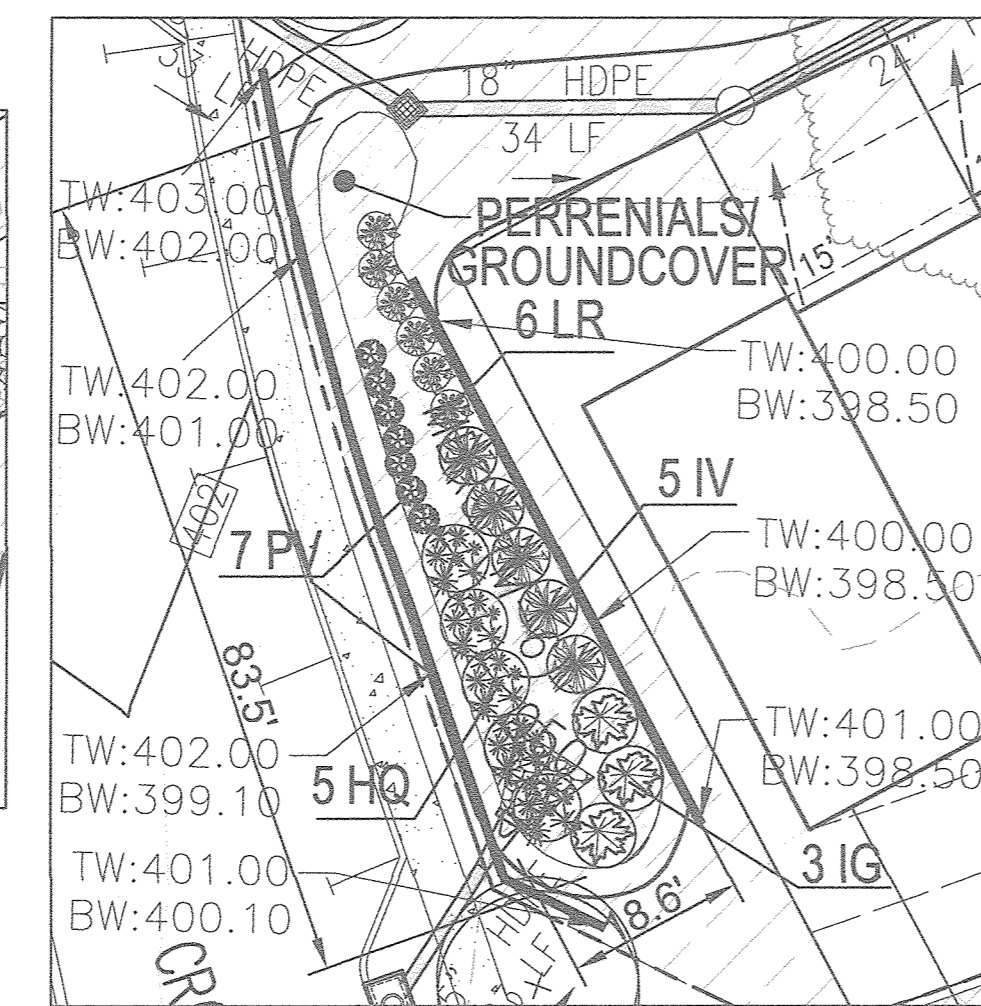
DETAILED BIO AND PLANTING PLAN (SWM #5)
